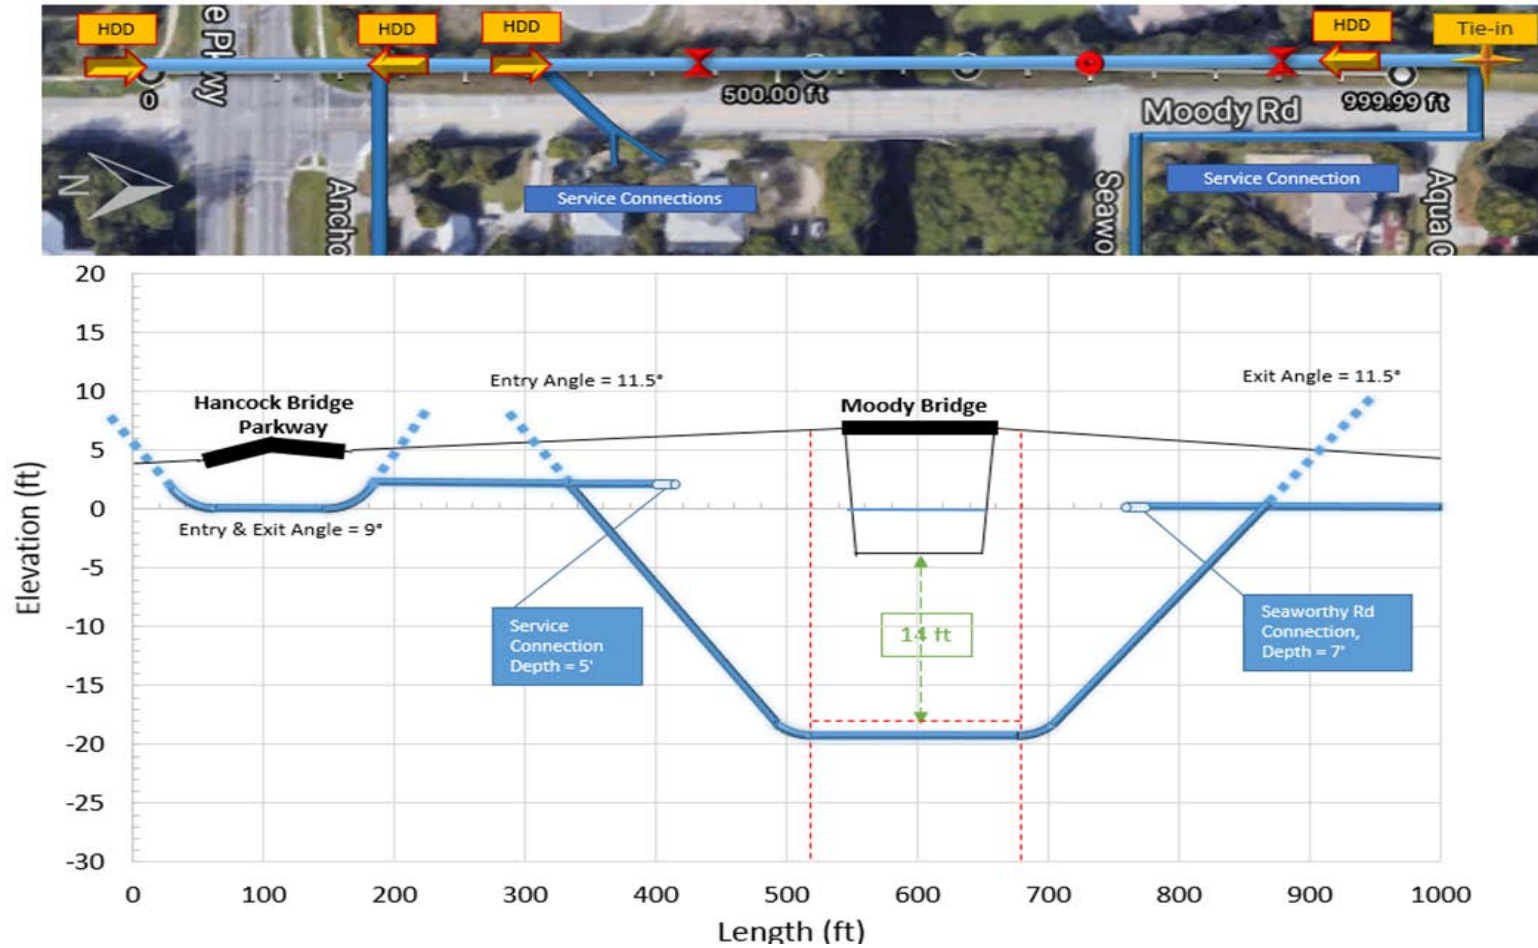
Moody Road Horizontal Directional Drill Elevation View
